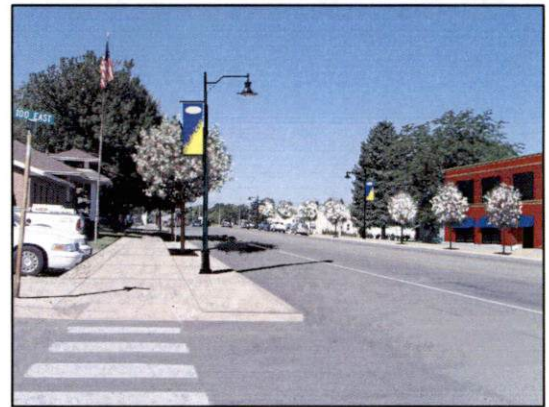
Existing Main Street, Figure 2: Main Street with street enhancements, Figure 3: New development with bulb-outs near Main Street core
